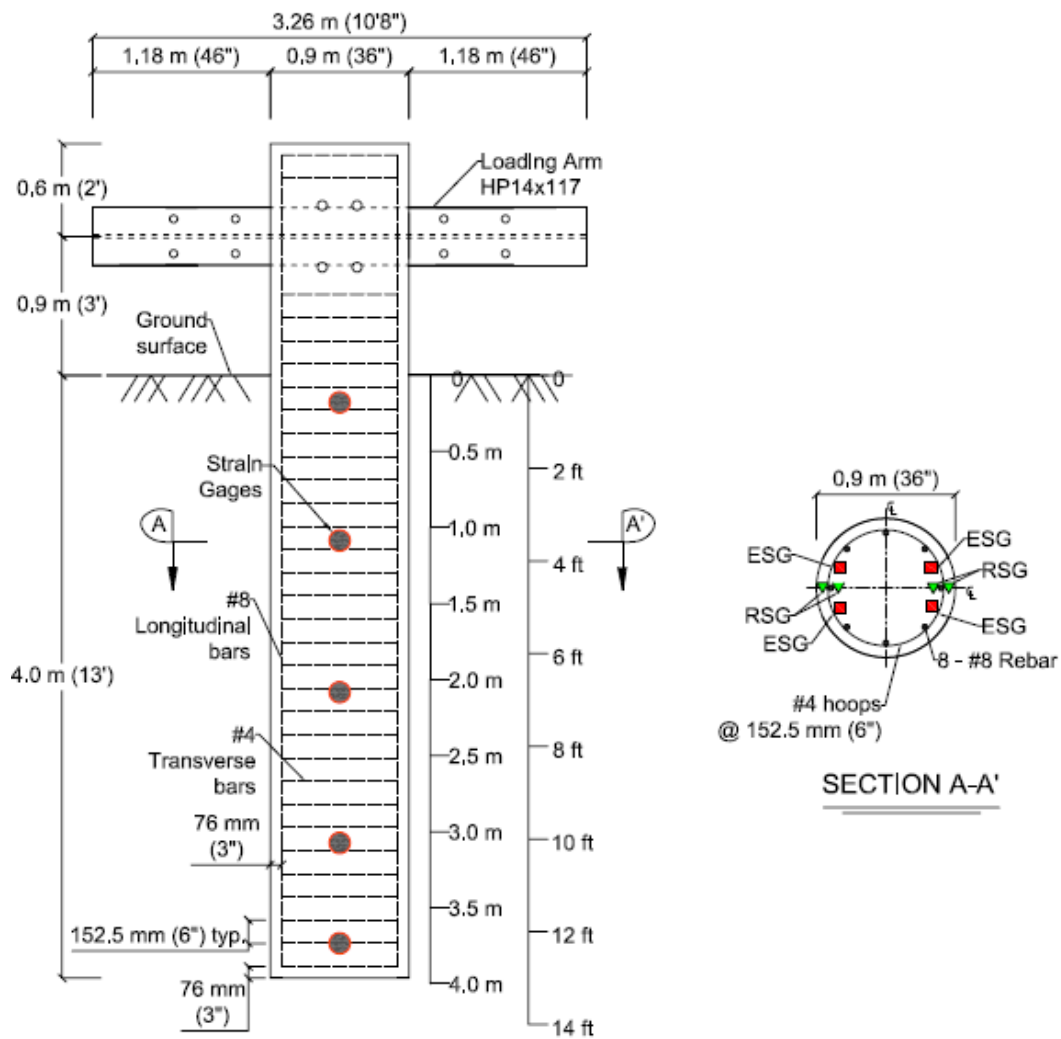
Schematic of drilled shaft elevation and cross-section of A-A'
